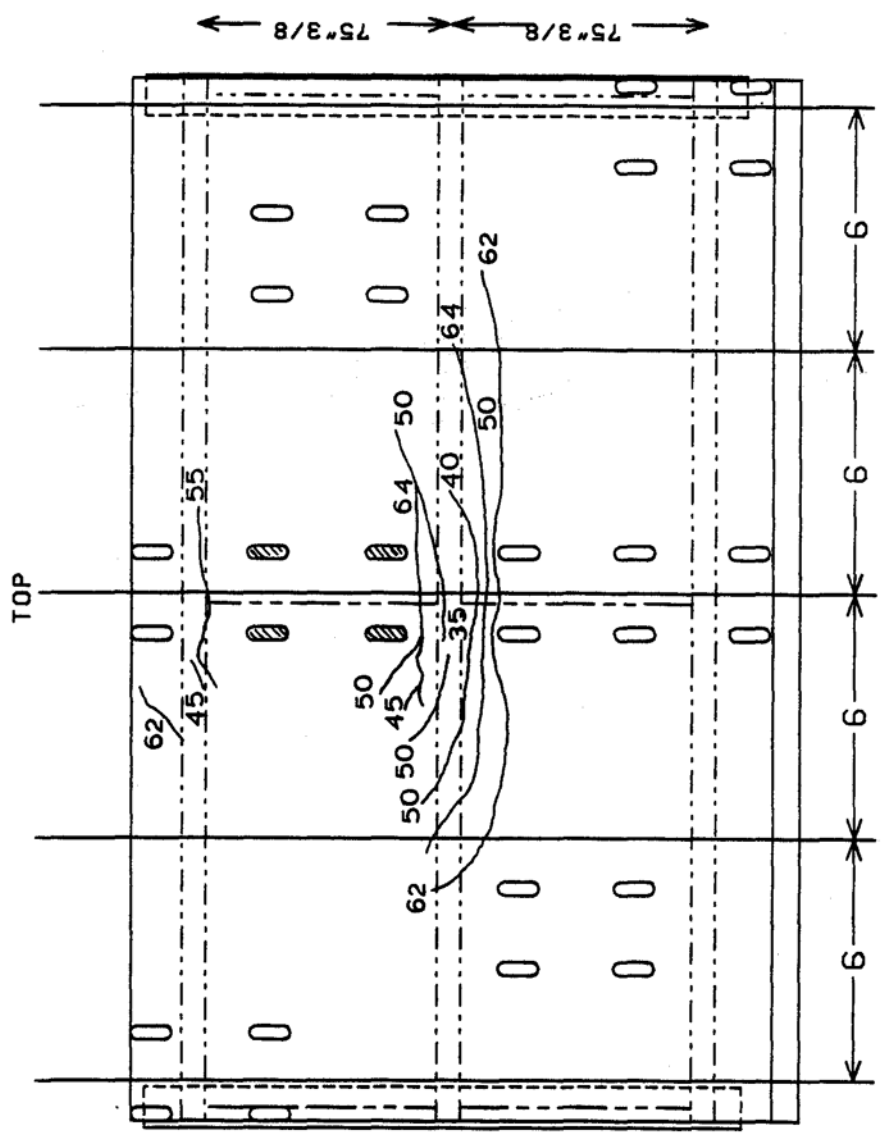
Top Cracking Pattern (Second Bridge - Test No. 1)
